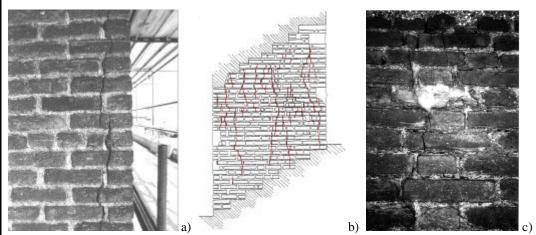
St. Giovanni Battista bell-tower. a) detachment of the corner; b) c) thin cracks on the wall (Binda et al. [6], [7]).
